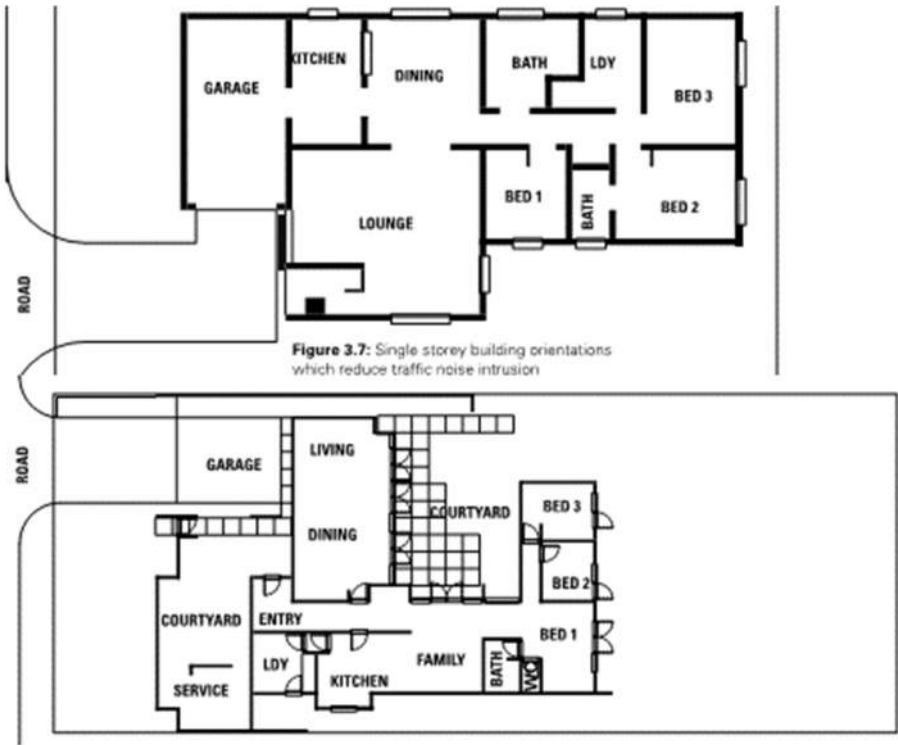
Building layout treatment – locating noise sensitive rooms away from noise source (Source: NSW DoP 2008)
